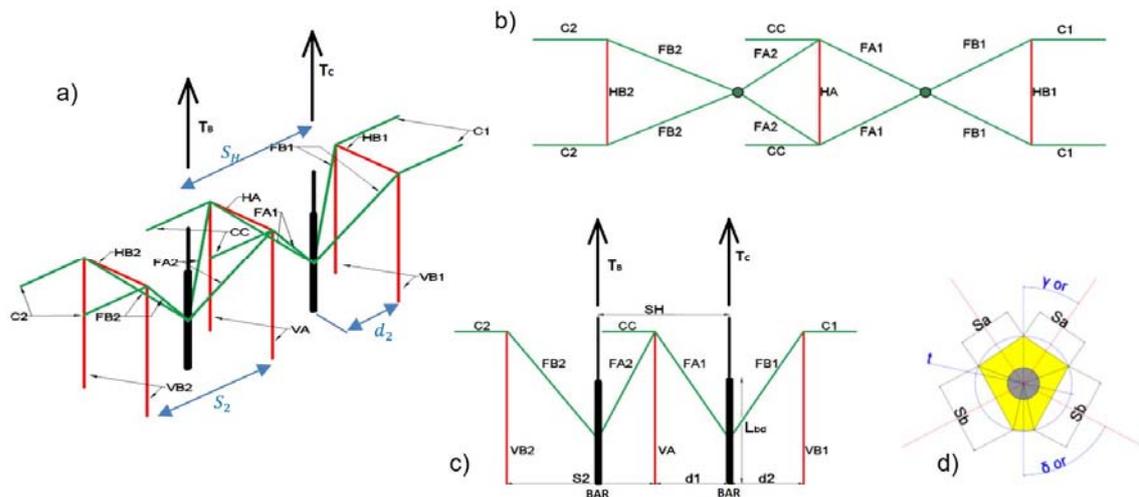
3D strut & tie model (a) 3D view of the axis of the elements (b) plan and (c) vertical view of the U-shaped rebars (red), concrete strut (green) and post-installed bars (black) (d) nodal region around the bar.
